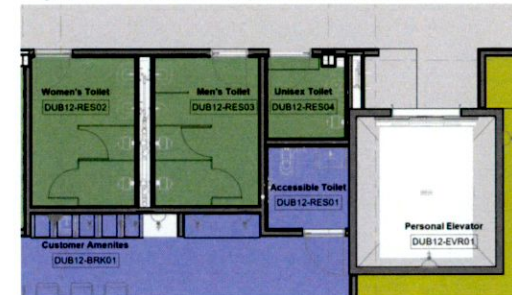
Accessible Toilets and Ambulant Disabled Toilets on Ground Floor In Close Proximity to Lift
